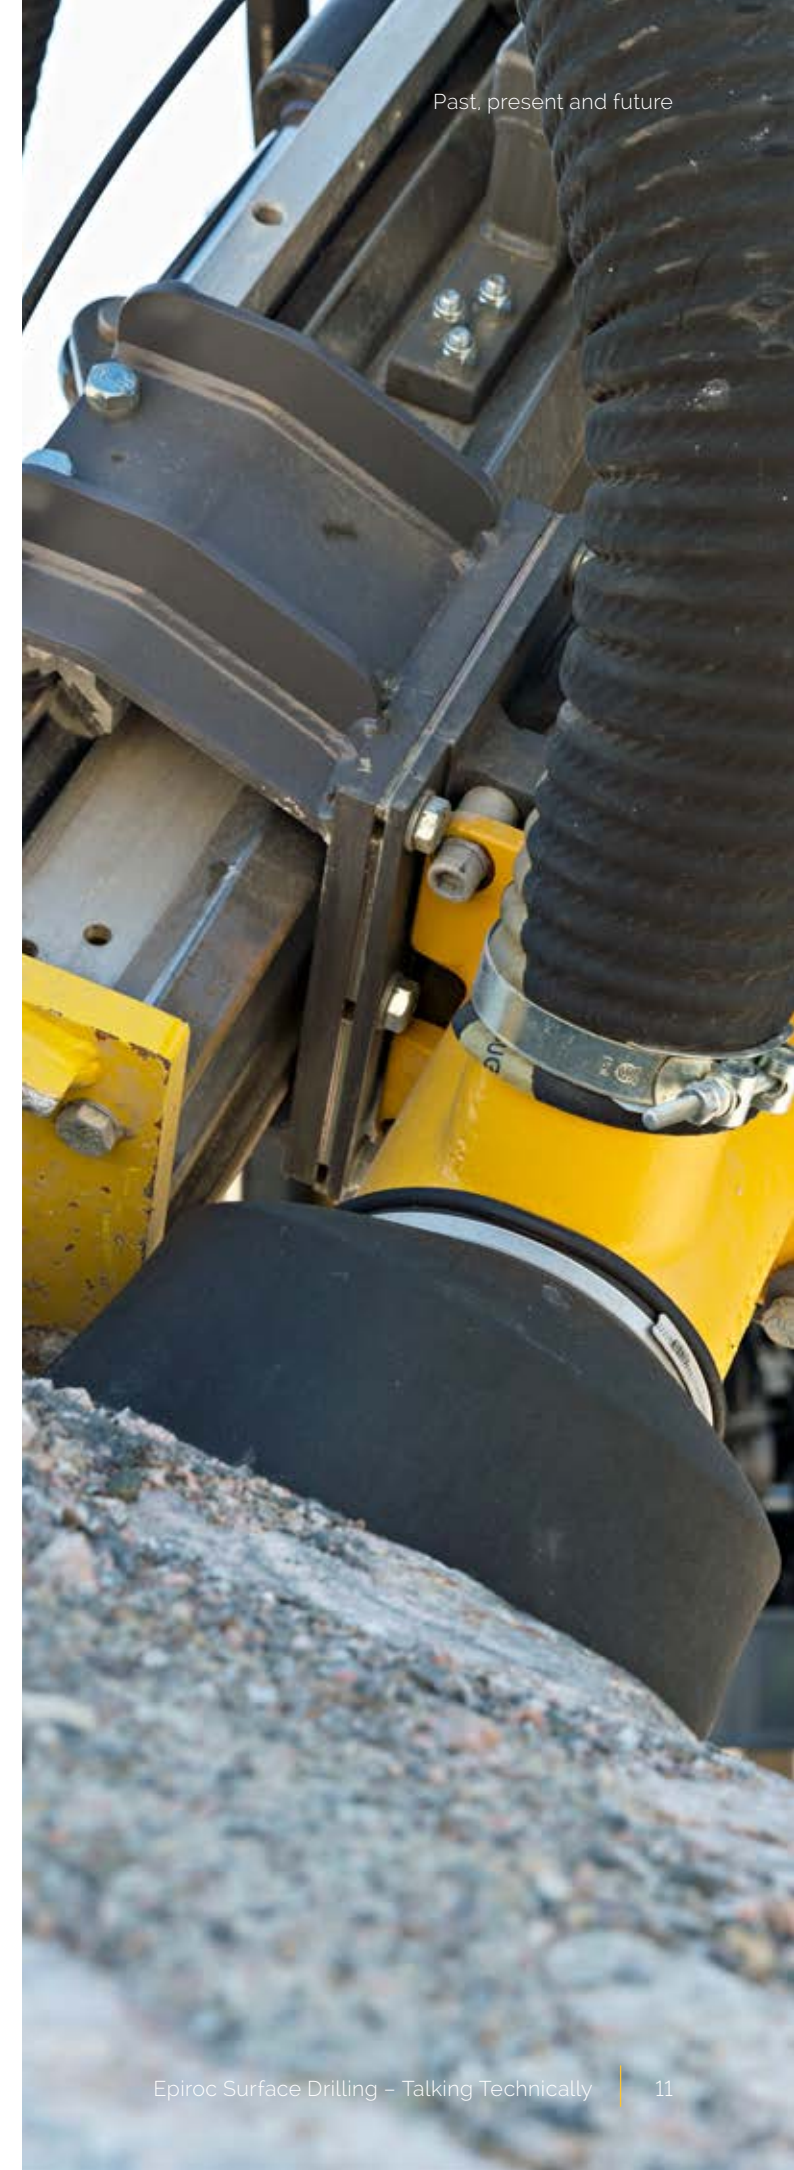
The main advantages of DTH drilling are excellent hole straightness without guiding equipment and deep hole drilling capacity.
